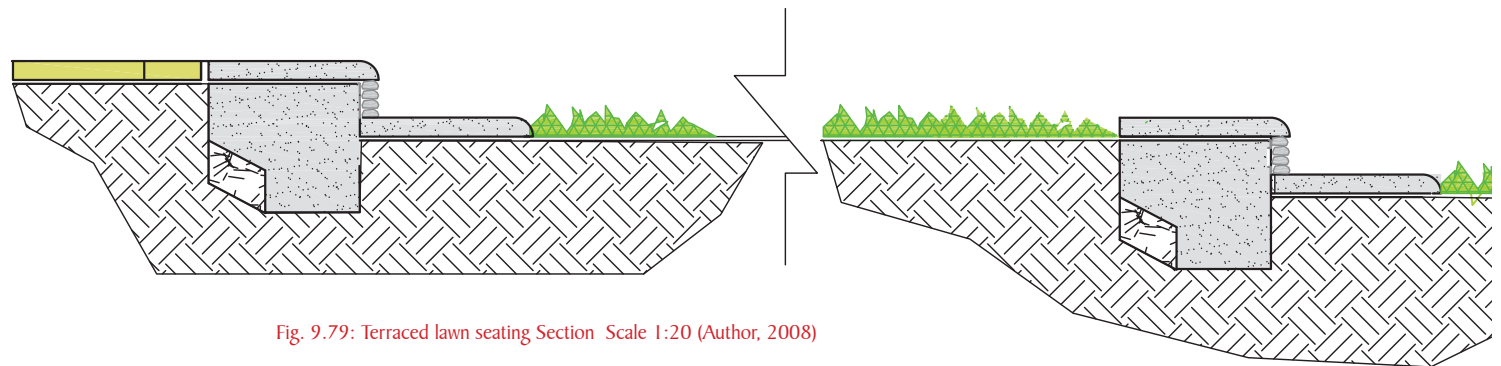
Terraced lawn seating Section Scale 1:20 (Author, 2008)
